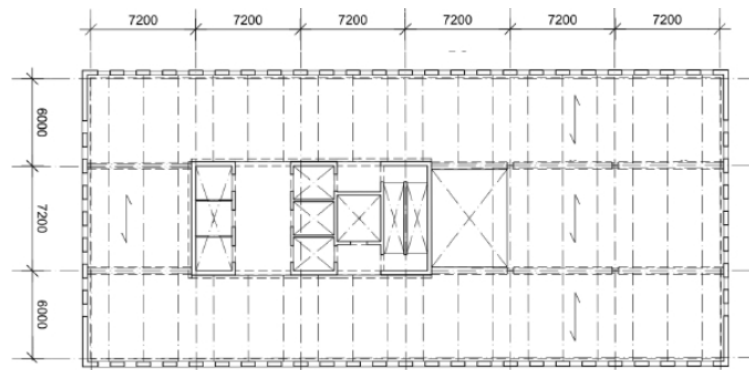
Typical floor plan of Erasmus MC, both peripheral panels and internal cores formed using precast concrete walls.
